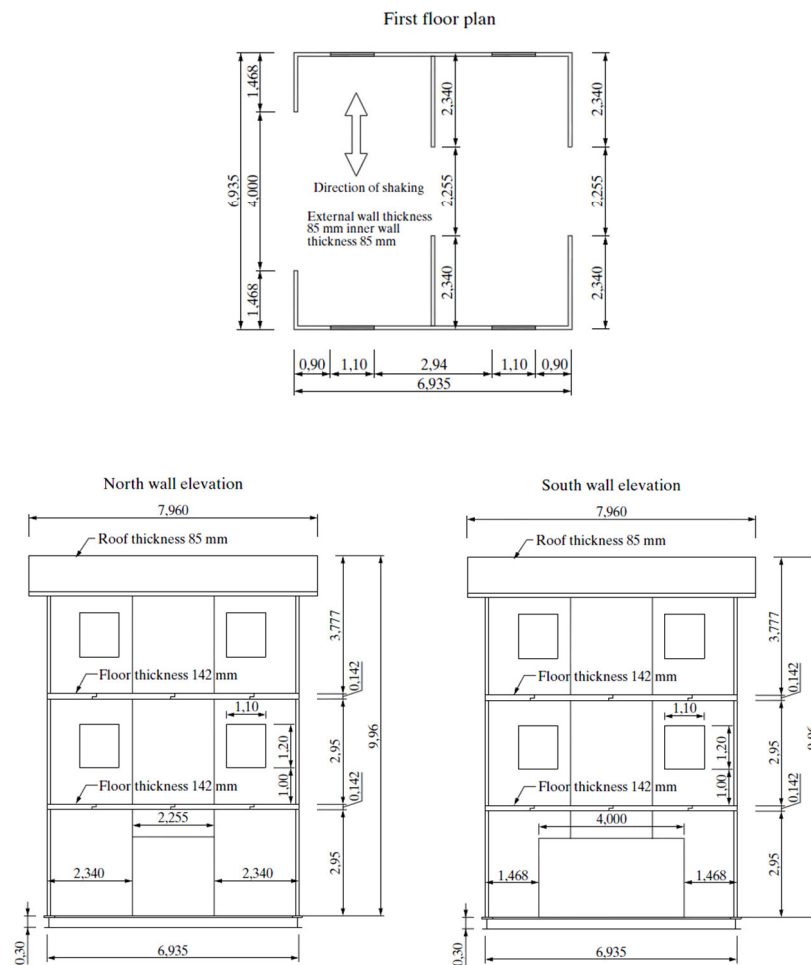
Plan and front views of SOPHIE project building (A. Ceccotti 2008)
